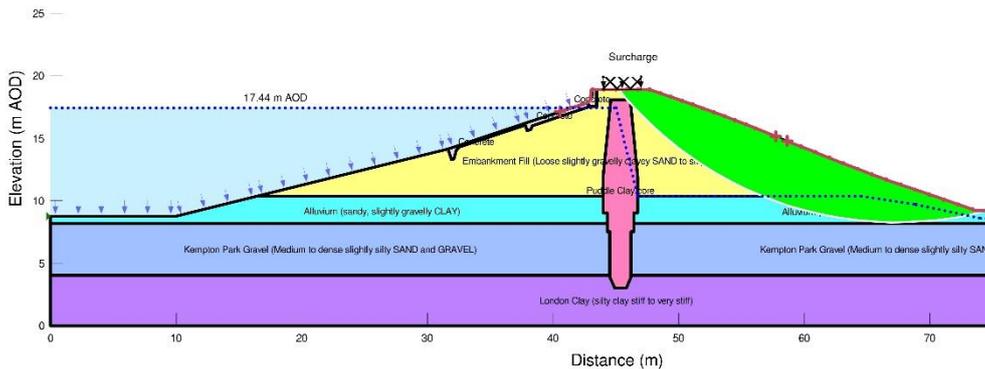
Dam Stability Analysis – Original section with tracking surcharge
